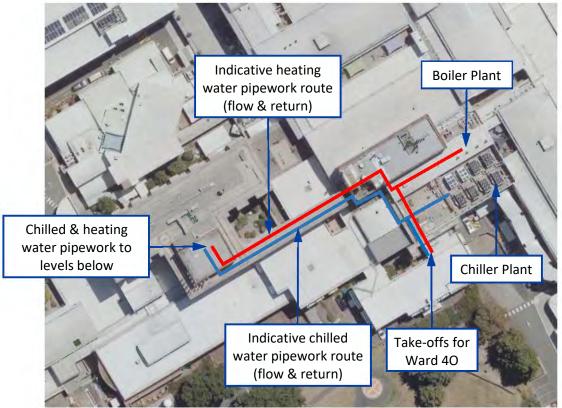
Proposed Chiller & Heating Water Pipework Route
